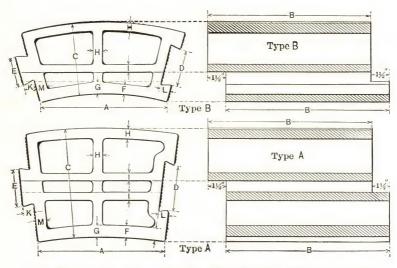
Sections of sewer blocks. (American Sewer Pipe Company.)
